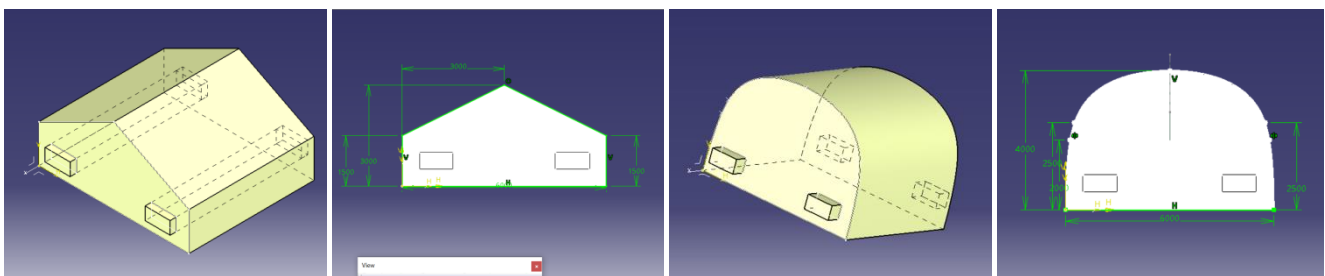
Chapel type greenhouse FIGURE 2 Cylindrical roof greenhouse
